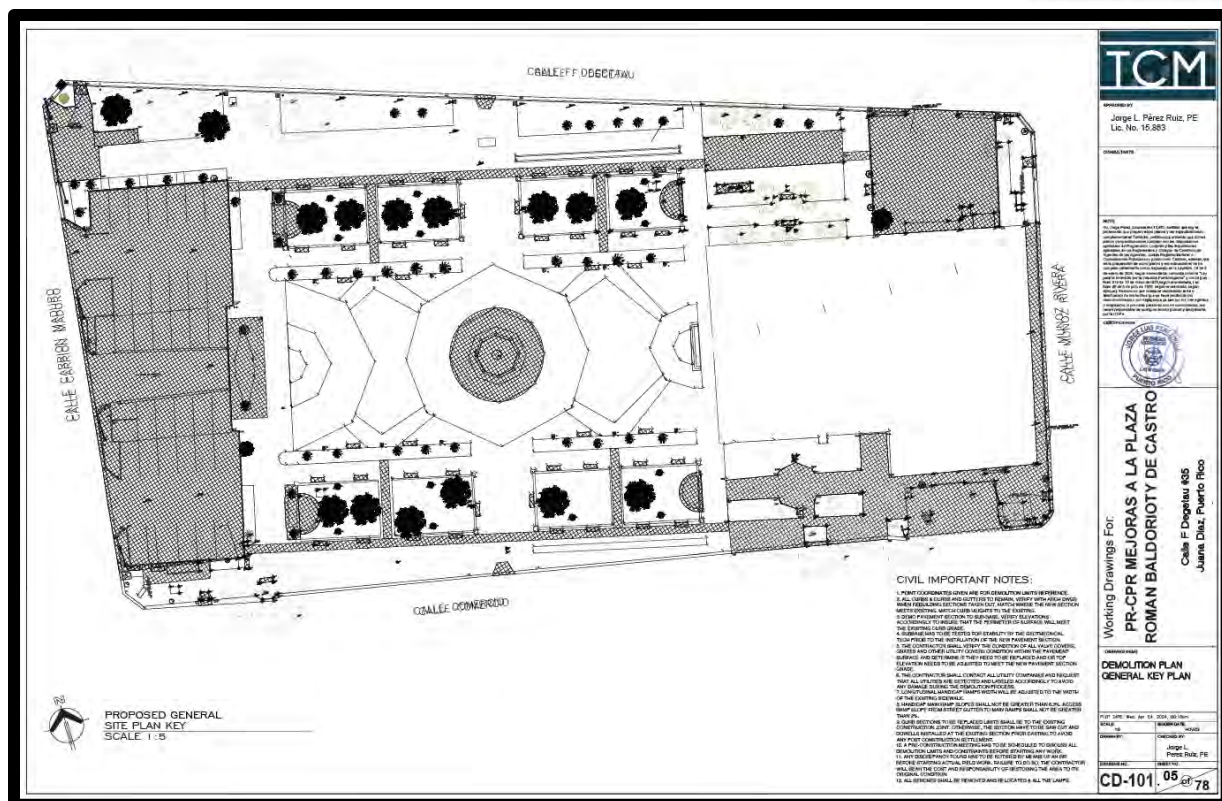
Design Plan 100%, (PR-CRP-000434)
